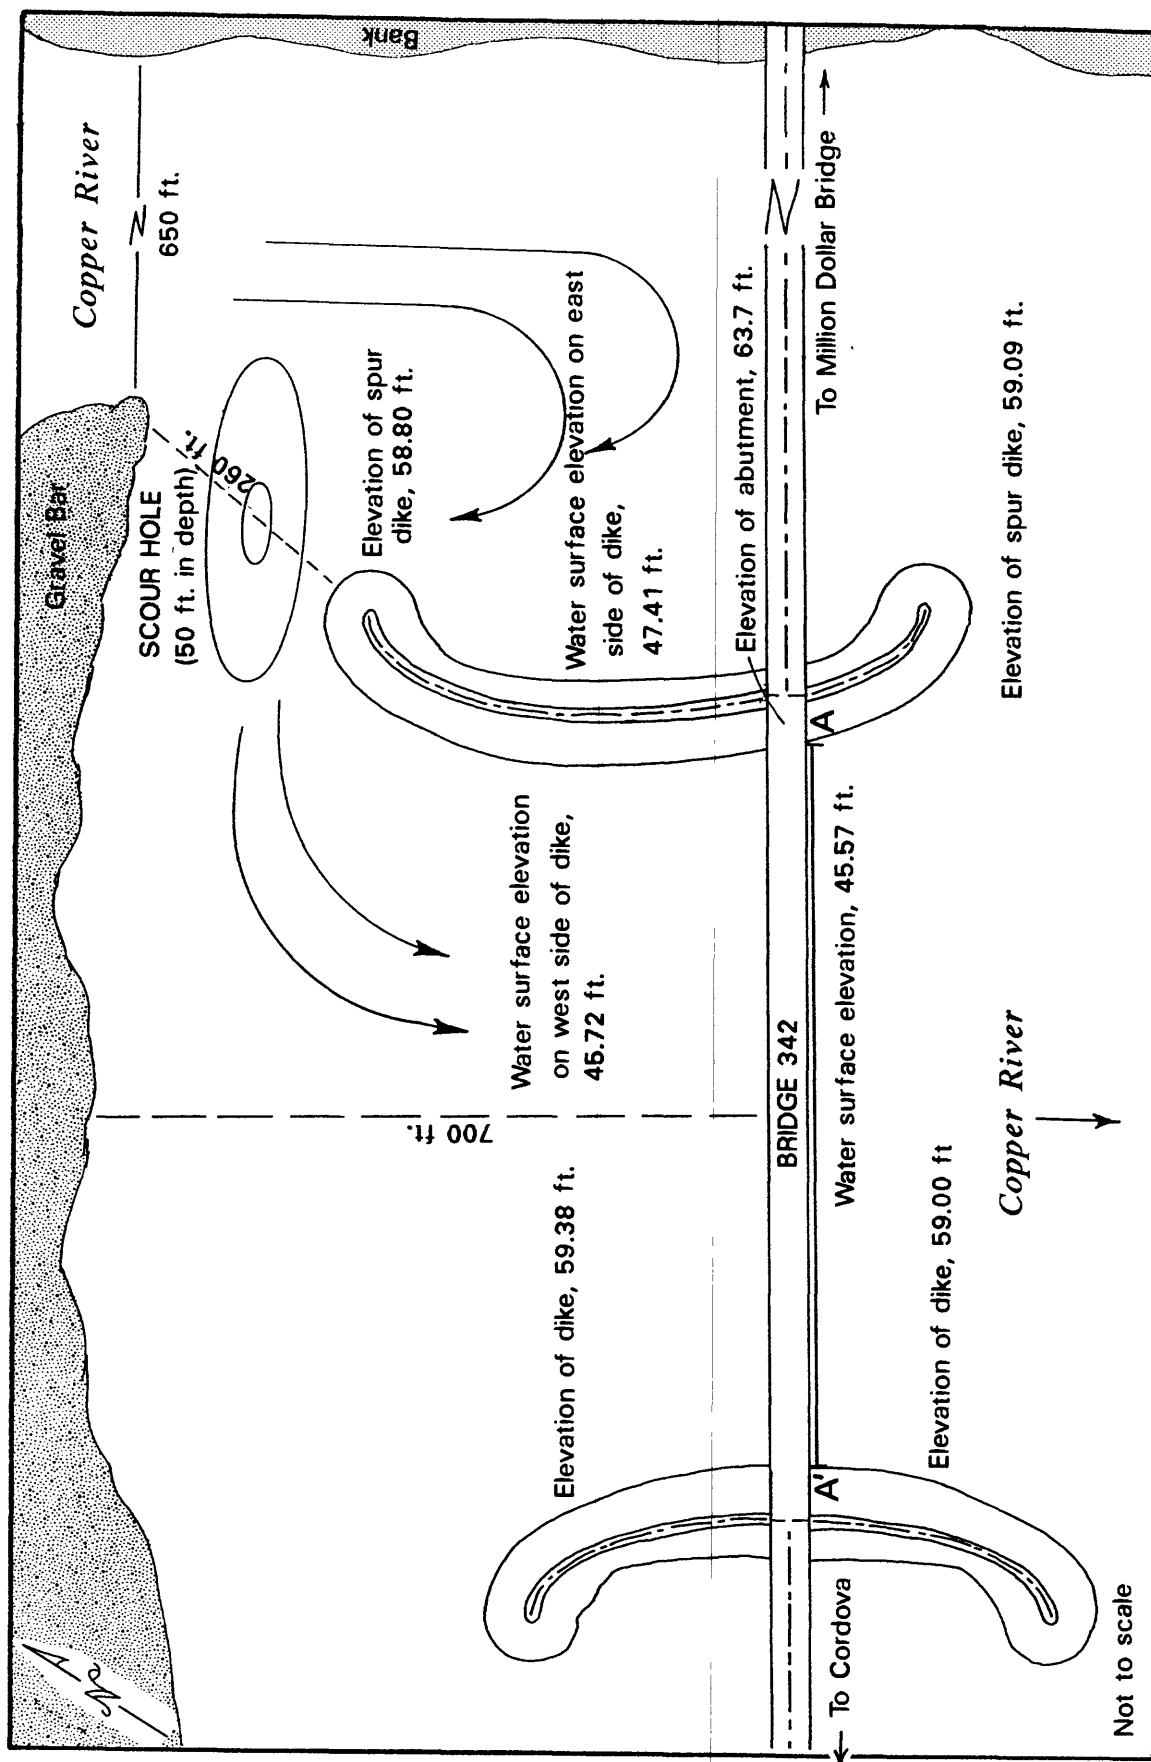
Bridge 342 area, showing elevation of spur dikes and water surface, and locations of cross section A-A', scour hole and gravel bar, May 23, 1991.
